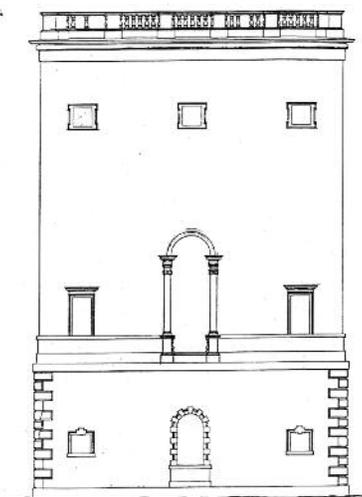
The Belvedere, west elevation, 1988. *Architecton.
